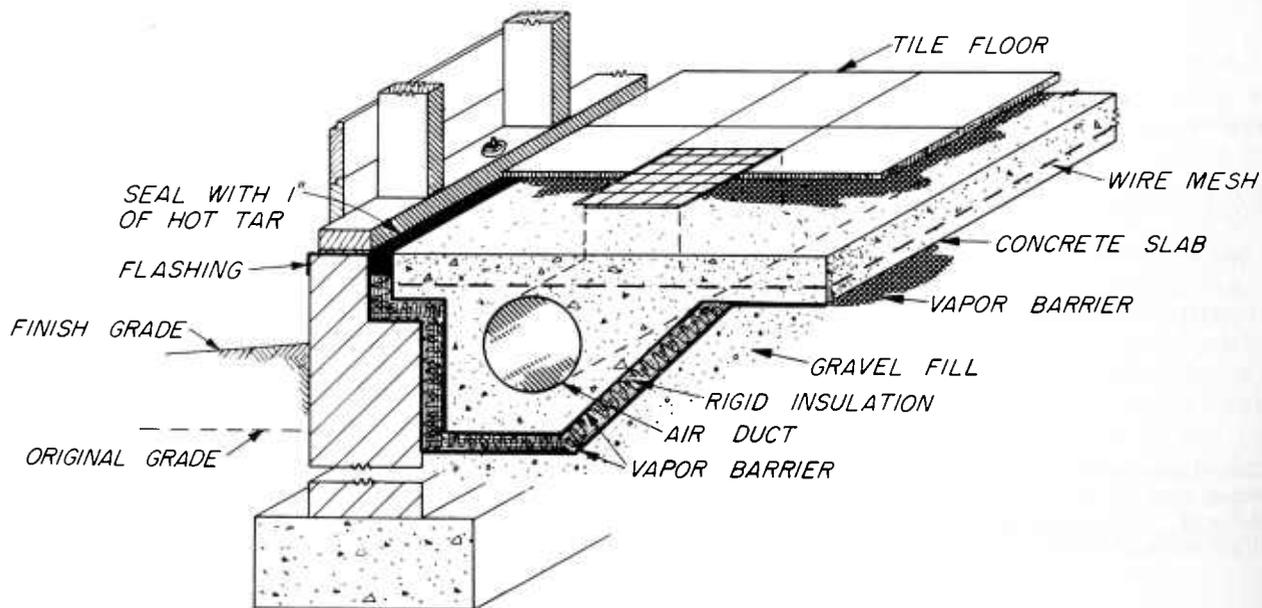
Independent concrete floor slab and foundation wall. Duct work located in slab around exterior wall. A permanent type of vapor barrier is provided on both sides of insulation to stop soil moisture and to provide protection from cold weather condensation.
